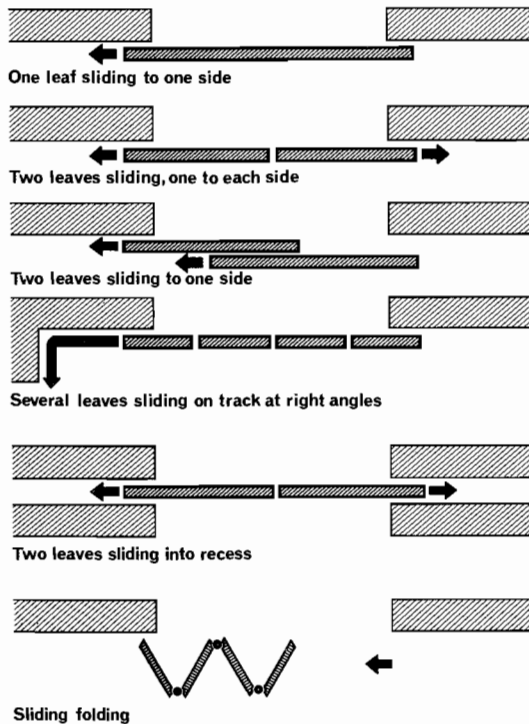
Diagrams showing plans of principal types of sliding door.
